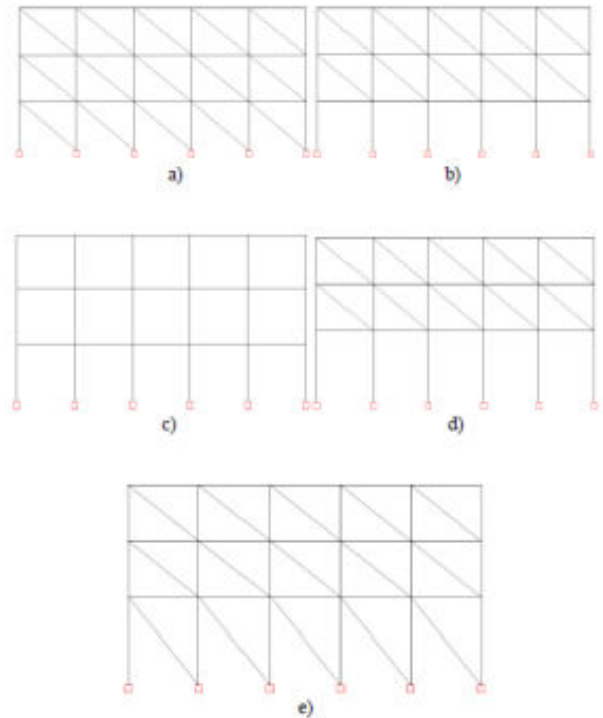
Elevation view of building models a) Ref, b) SSW, c) RefWW, d) SS-H-W, e) SS-H
